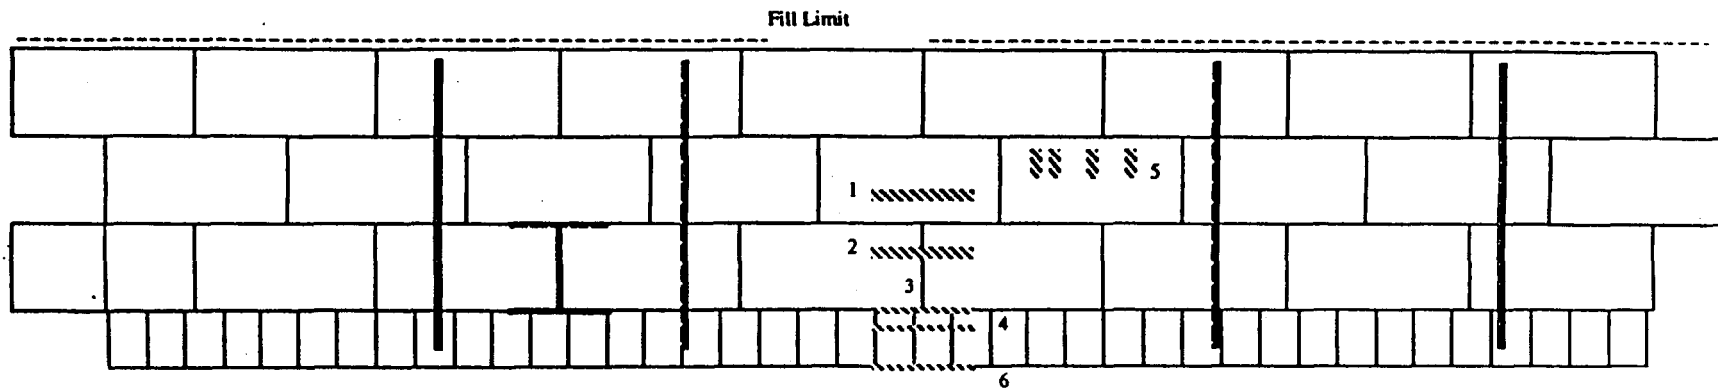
Unwrapped Surface of a Typical Type III Waste Tank, Illustrating TSIP Inspection Requirements (---) and Planned Inspection Extent (—) at SRS.
